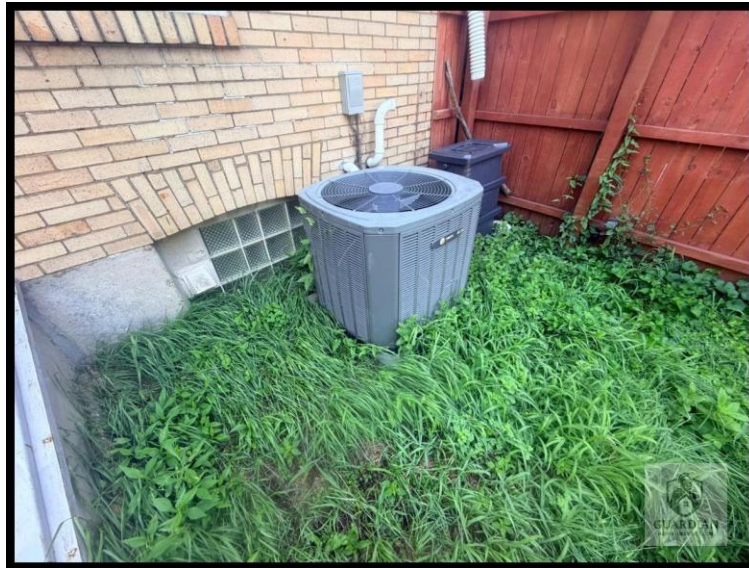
Overgrown vegetation and debris were observed inside and around the outdoor A/C condenser, restricting airflow through the coil area and limiting service access.
